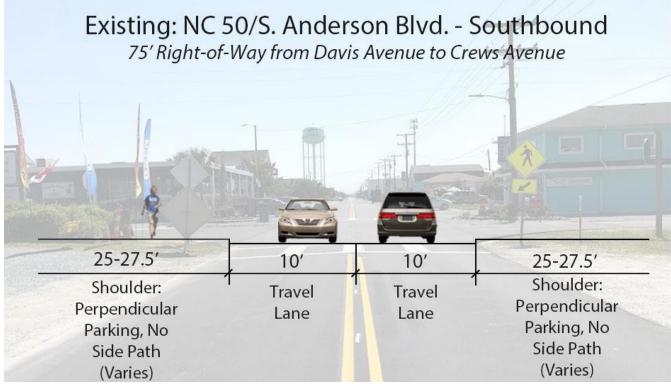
Cross Section of Anderson Boulevard from Davis Avenue to Crews Avenue.
